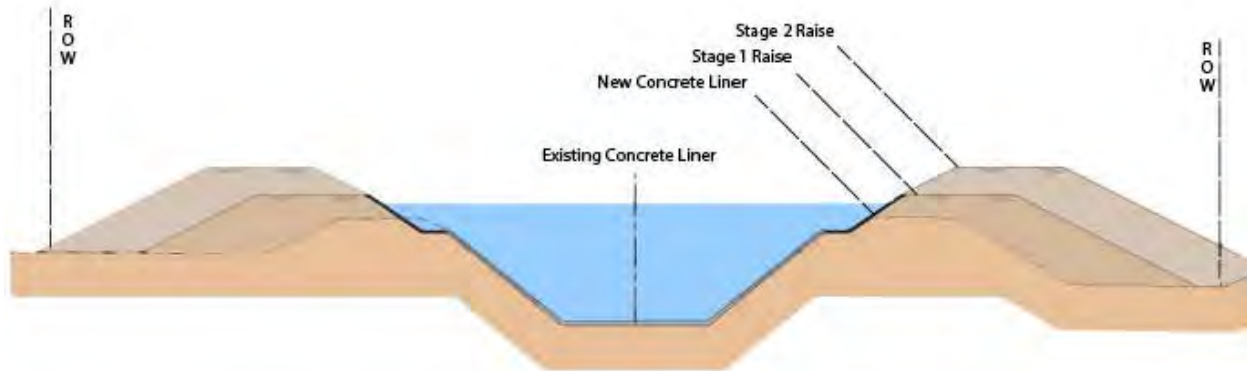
Typical Canal Enlargement Cross Section with 10-ft Slope Stability Bench
